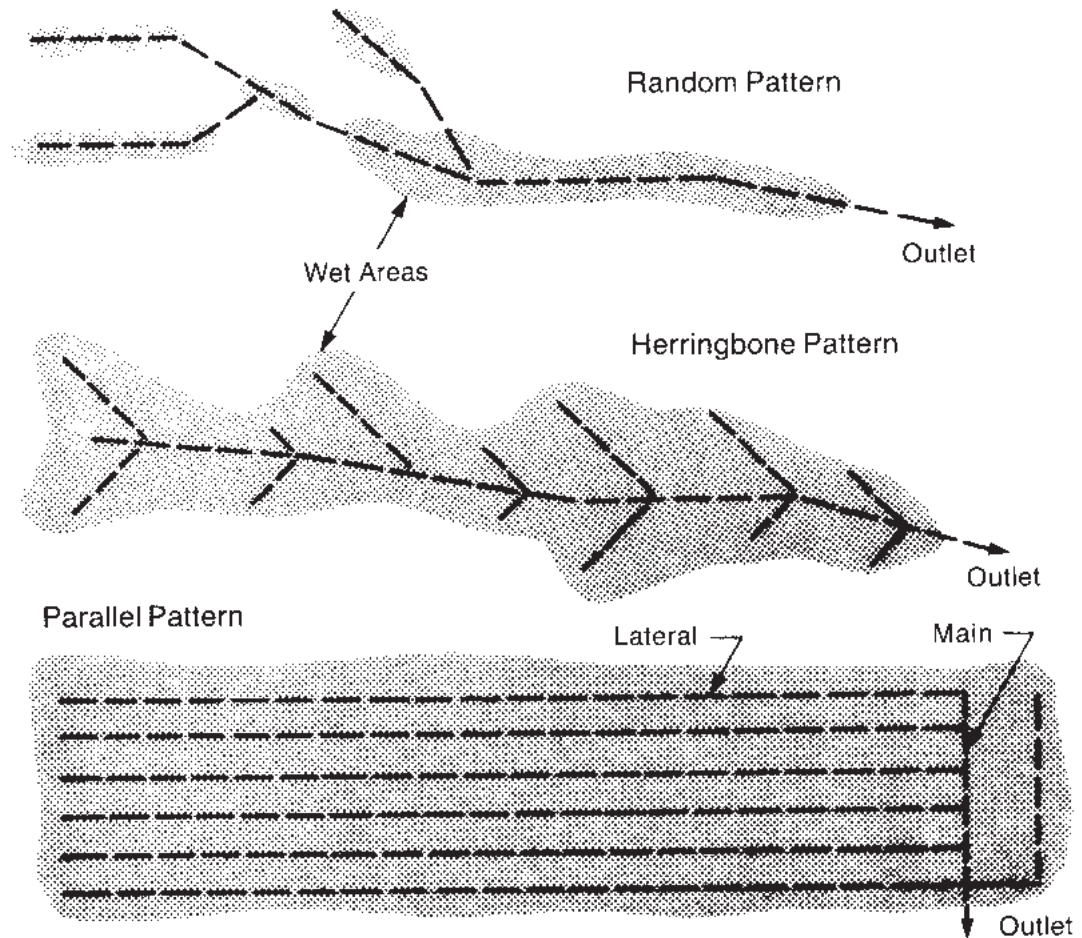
Subsurface relief drain layouts (source: USDA-SCS).
